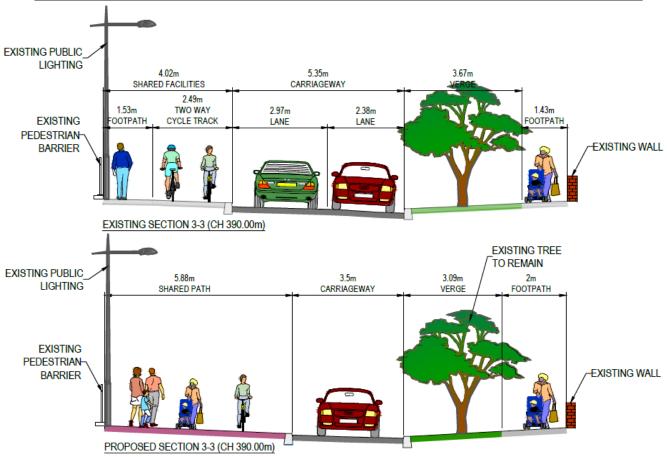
Propose and existing road cross section No 3 on Dodder Road Lower.
